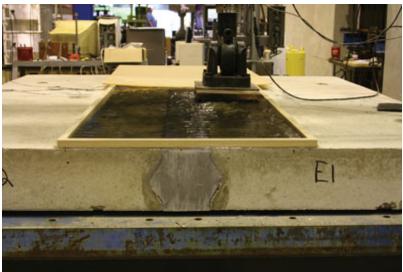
Ultra-high performance concrete connections are tested at FHWA's Turner-Fairbank Highway Research Center. These connections can link prefabricated bridge girders to precast concrete bridge decks.
